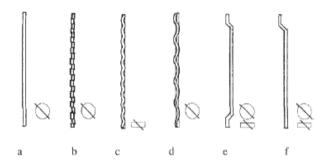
Steel fiber types with different geometric properties, (a) straight; (b) waved; (c) crescent; (d) class C hooked end; (e) hooked end; (f) single hooked end [5]
